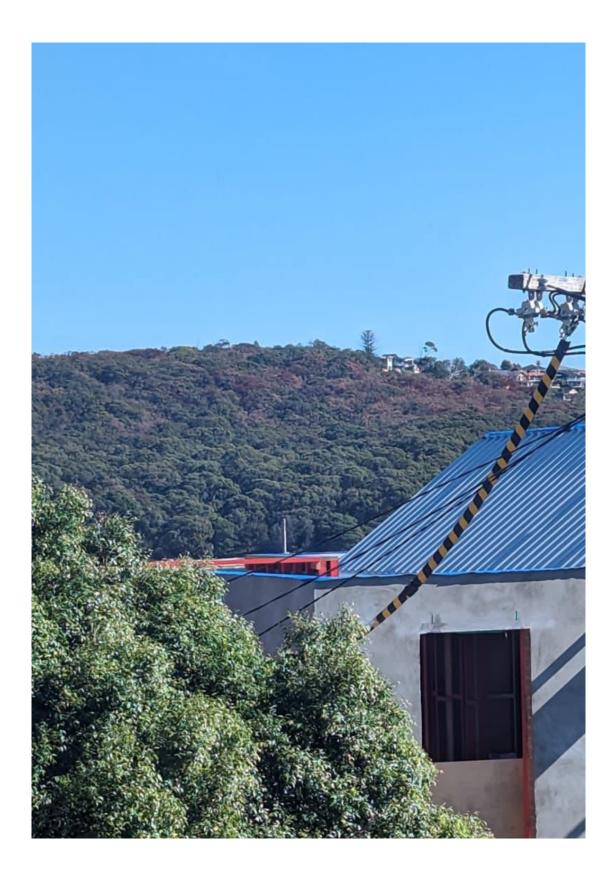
Zoomed view from balcony of 10 Oyama Avenue Street looking at subject site with height poles established (photograph provided by property owner)
